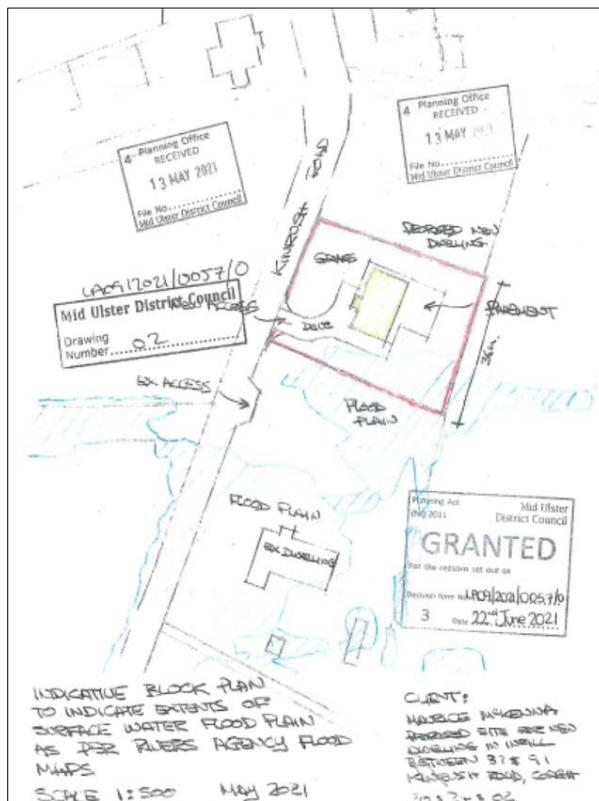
Indicative block plan submitted under LA09/2021/0057/O
